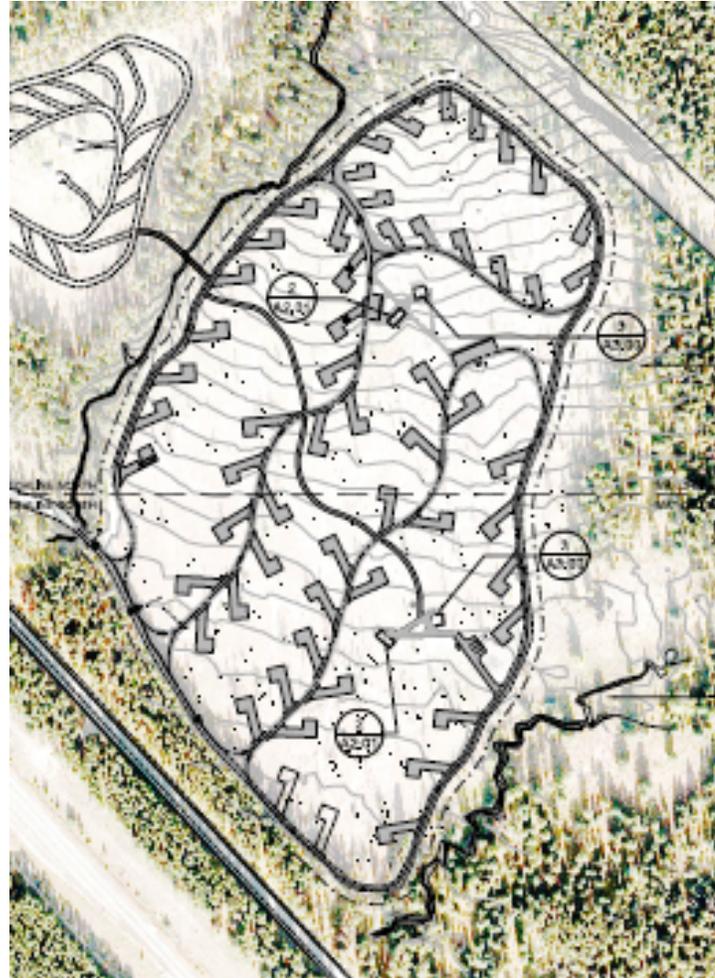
Proposed Protection Mountain Campground re-development final concept plan
